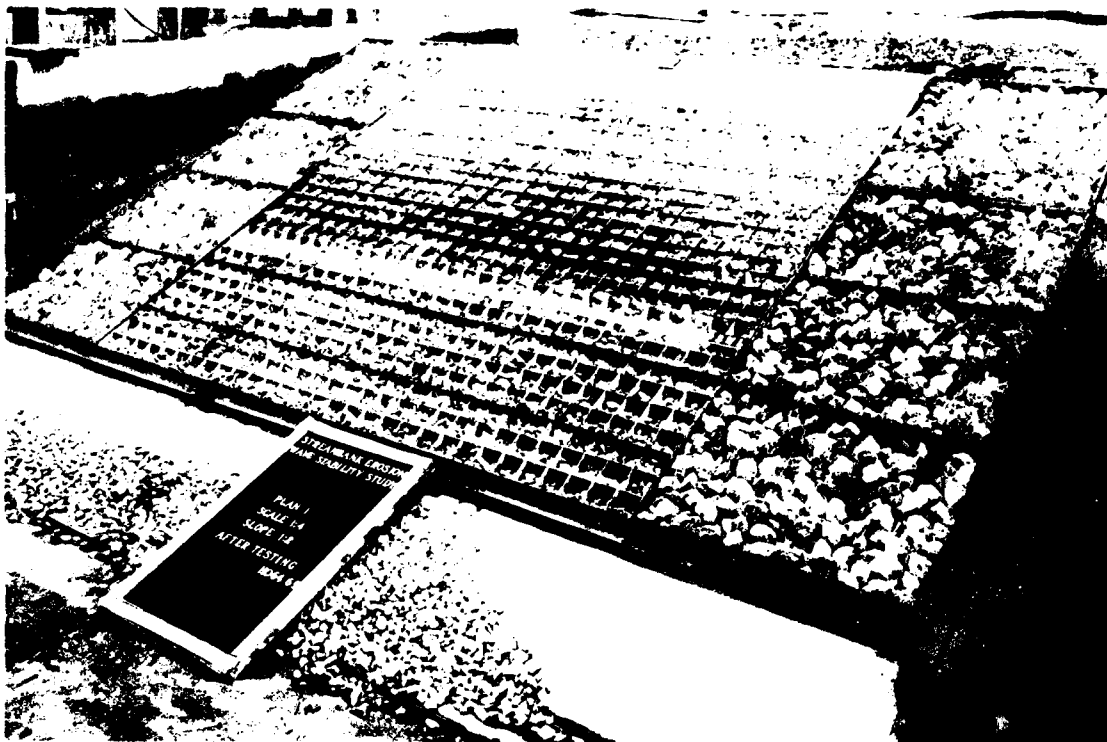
Plan 1, after exposure to 4.0-sec, 1.0- to 3.0-ft nonbreaking waves; wave direction 2
